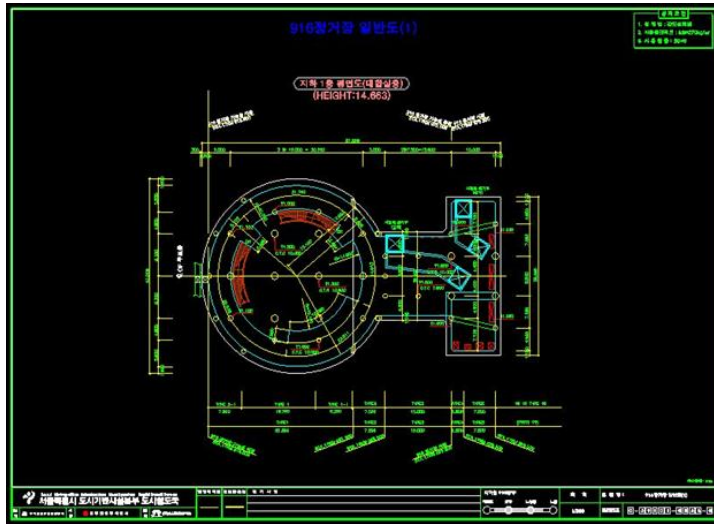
Character marking for the location and floor height of the subway station floor plan (The source of map: Saetgang 916 station)
